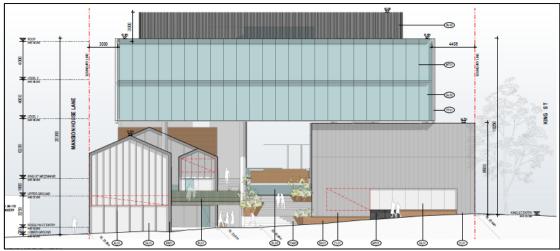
South-east Elevation (Drawing No. TP02.02)
